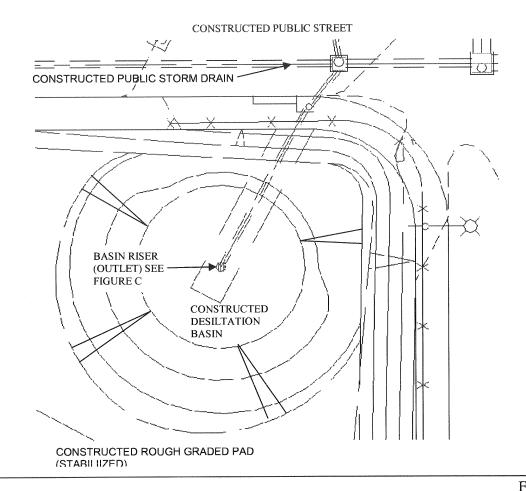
Figure B Schematic Example of Desiltation Basin (DSB) (Not a Standard Plan) Ď D1 DEBRIS RACK CAGE PER 10' d <u>E.3</u> ... 3/4" GRAVEL HEIGHT="H" MOUND AROUND PIPE (1.5'HIGH) (E2-E1) E2 0.5% MIN. 0.5% MIN. 425 E1 1.5' MIN. STORM DRAIN SIZE & SLOPE PER PLANS -ELEVATION PER PLAN 1" MIN. P.C.C. FILLET PER CALTRANS STD. PLAN D-96 SEE NOTE FL PER PLANS P.C.C. ANCHOR BLOCK 12" MIN. SURROUND RISER & OUTLET PIPE. REINFORCE W/ 6"x 6"x 10 GAUGE WELDED WIRE FABRIC.
